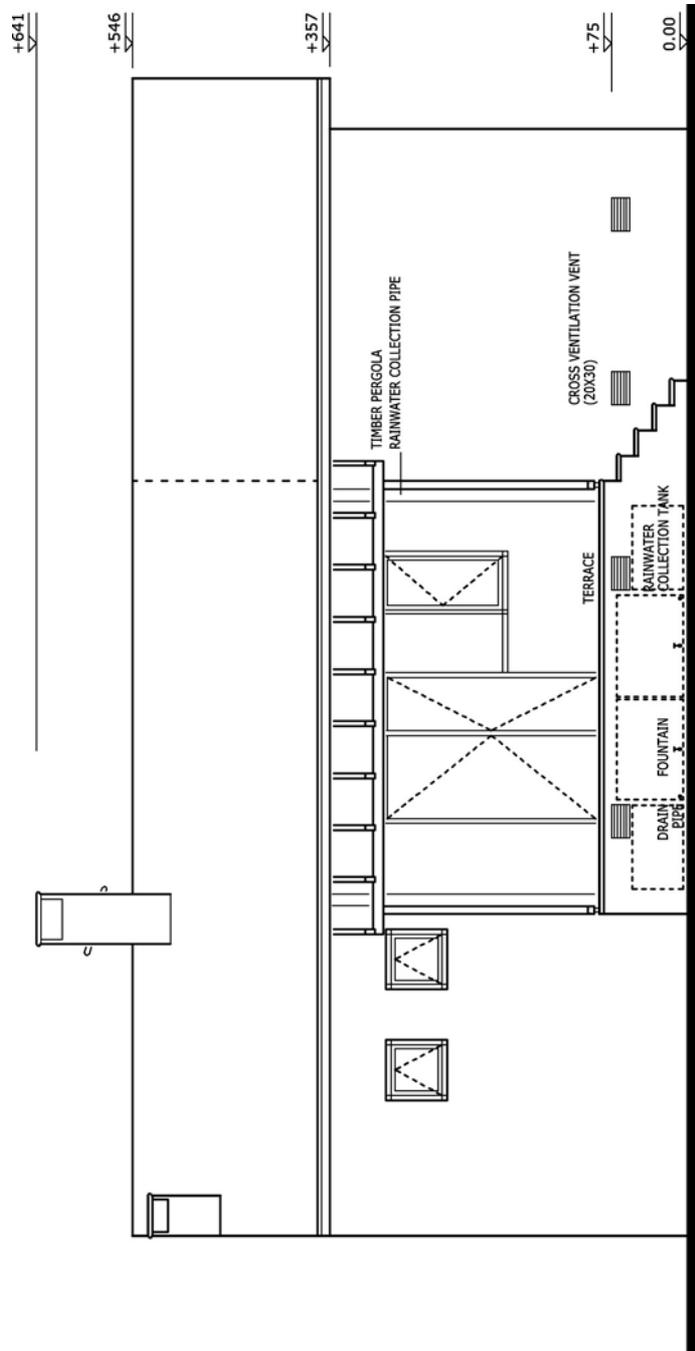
Northern—entrance—façade of type D₁' dwelling; Scale 1/80
